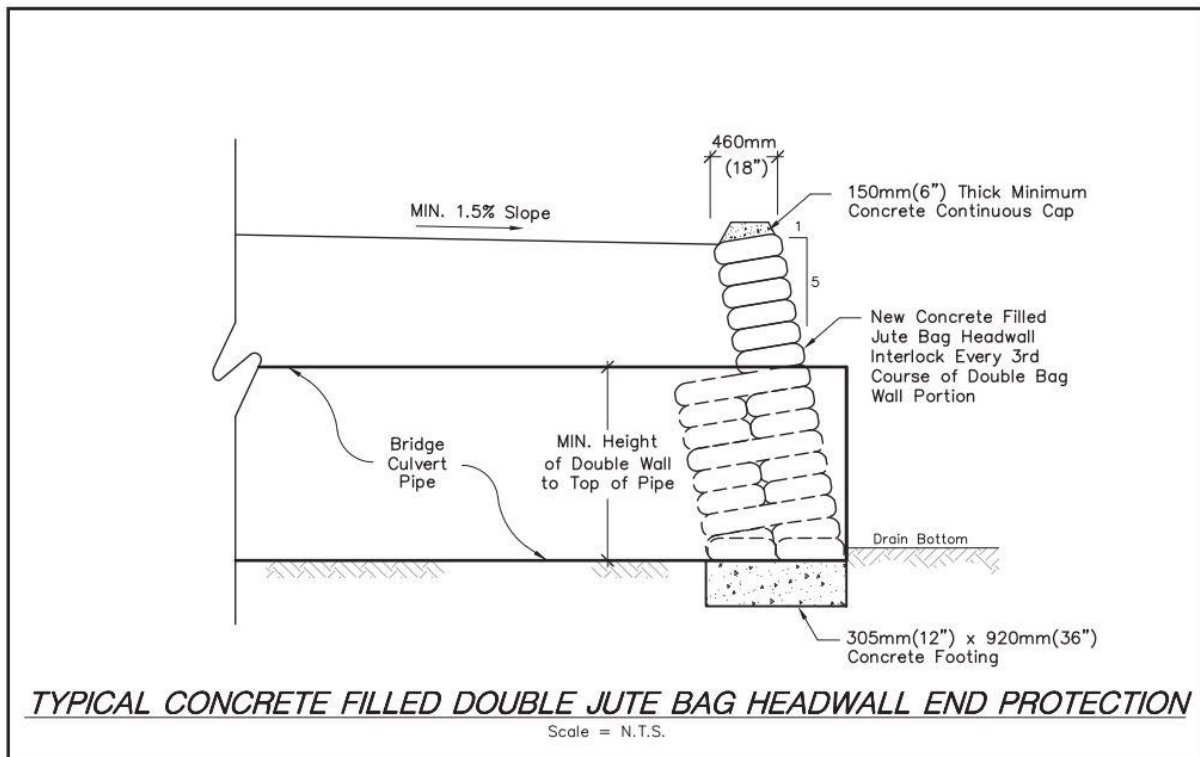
Typical Concrete Filled Double Jute Bag Headwall End Protection Detail
